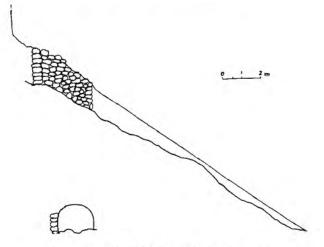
Hafik Kalessi. Plan of the tunnel
